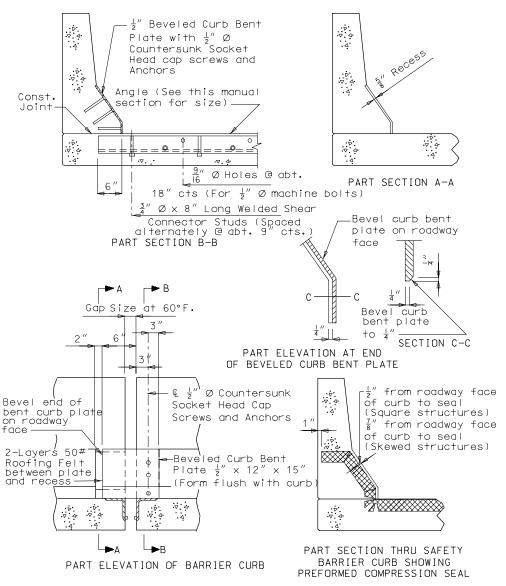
DETAILS AT END BENTS (PRESTRESSED STRUCTURES) Preformed Compression Joint Seal
